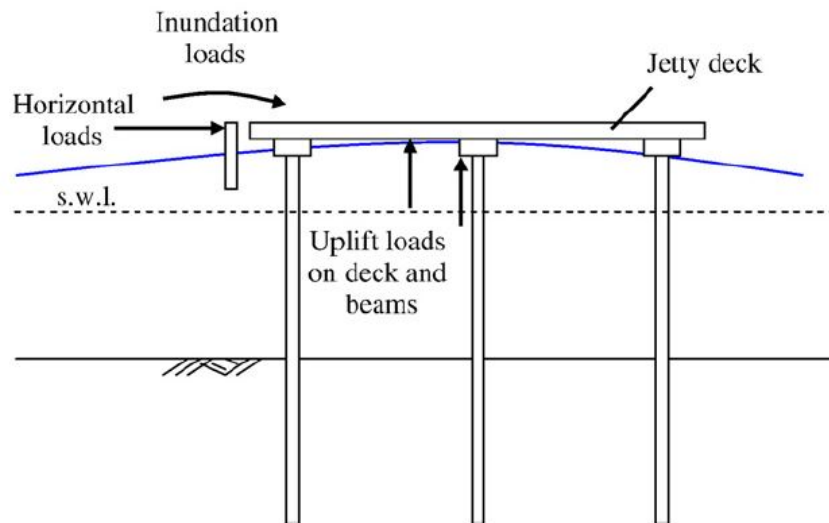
Wave-in-deck loads on a pile-supported deck. From Tirindelli et al. (2003)
